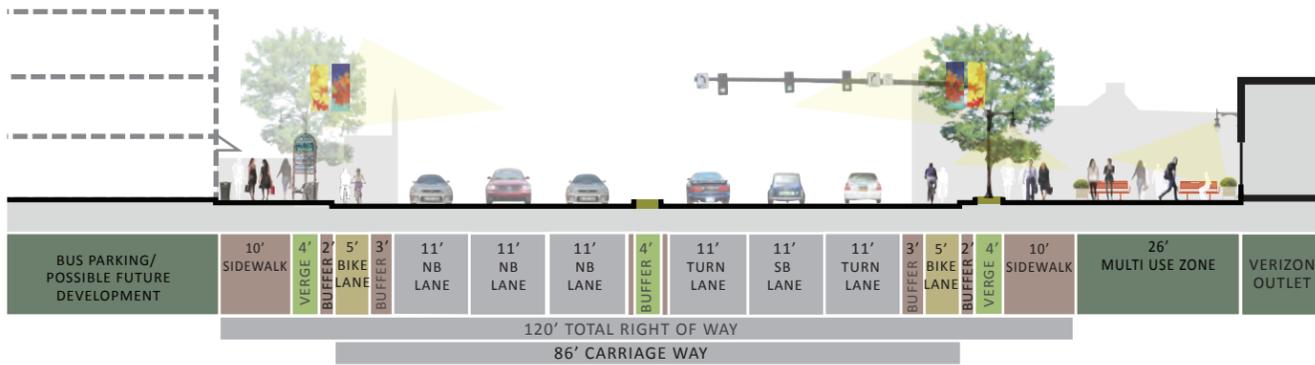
Section AA' Through Franklin Street Near Somerset St. Looking South
